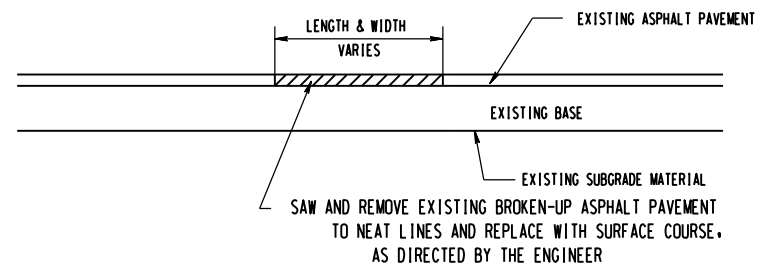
DETAILS OF PATCHING EXISTING PAVEMENT PRIOR TO RESURFACING FOR FULL DEPTH AND MILLING
